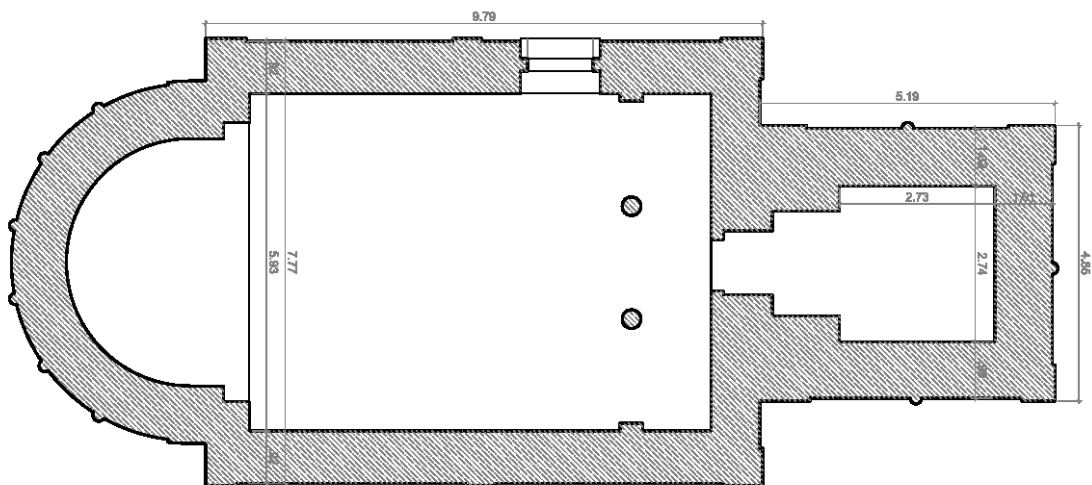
Ground floor, CAD drawing. Pablo Bañasco, 2018.
